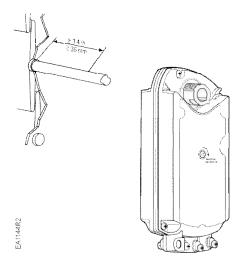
Shaft Length and Proper Shaft Adapter Location.
